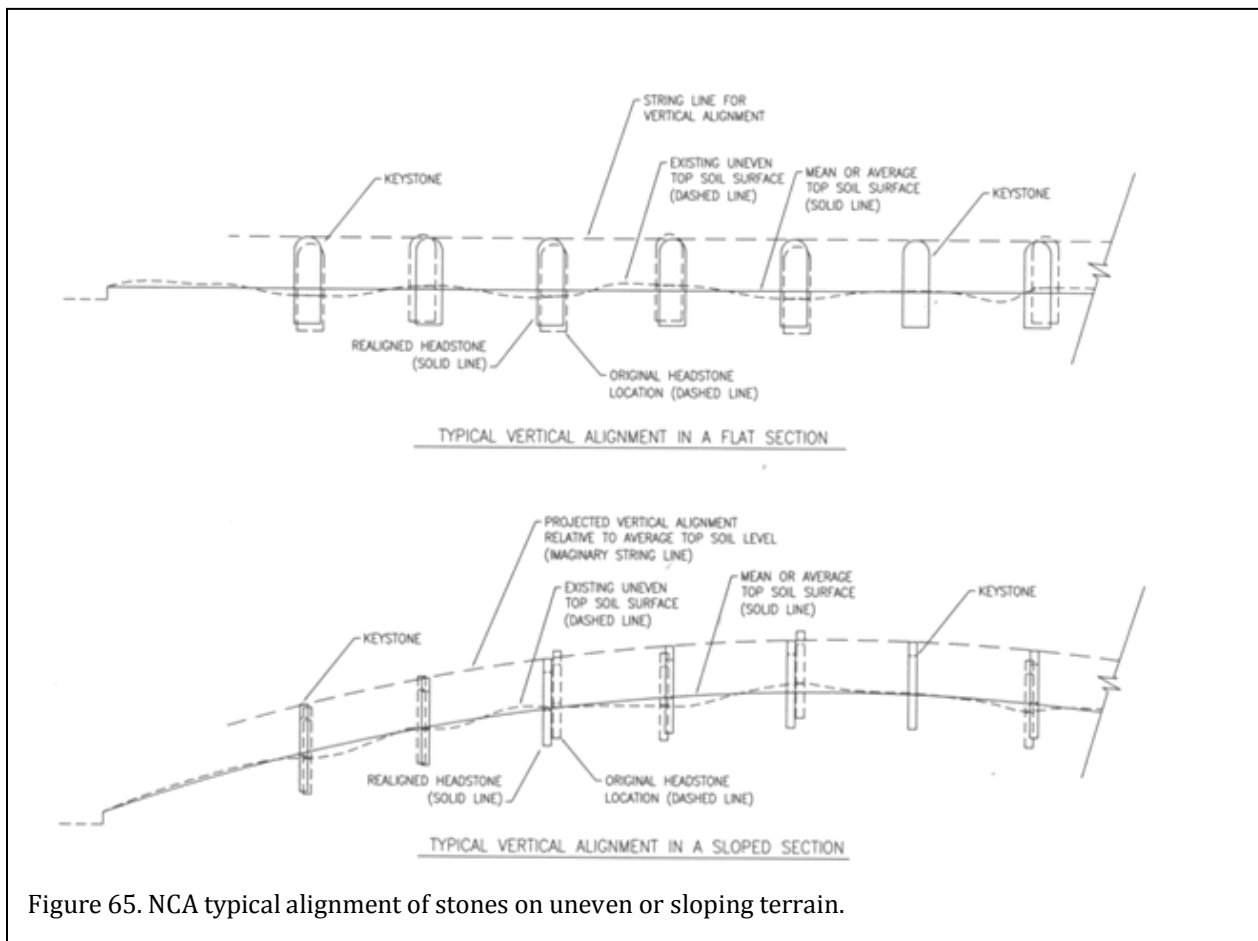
NCA typical alignment of stones on uneven or sloping terrain.
